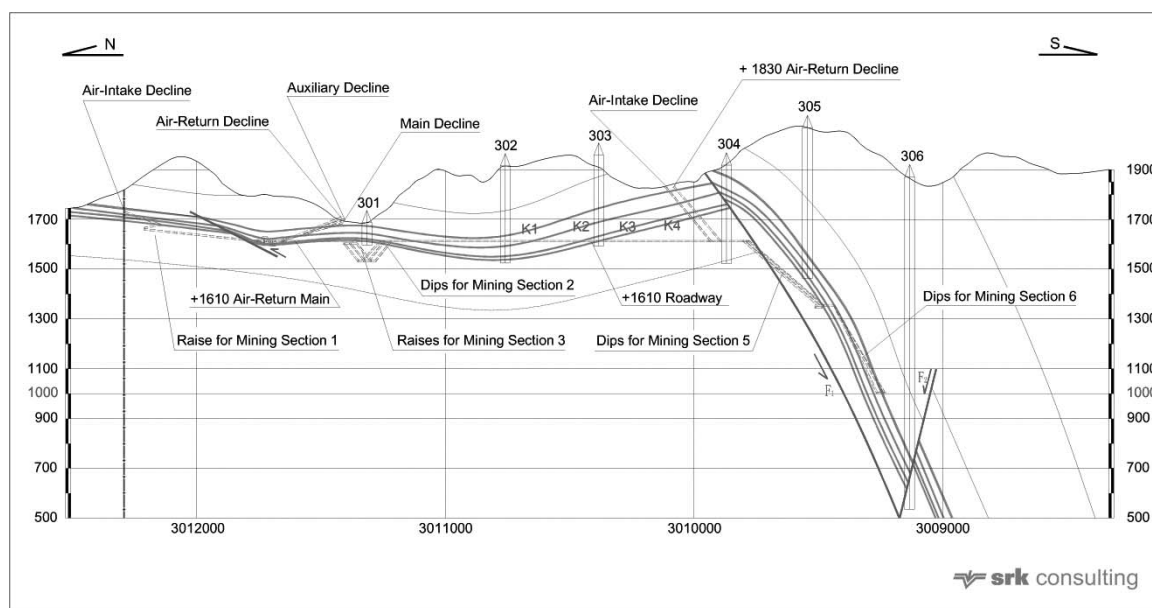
Typical North-South Cross Section through Lasu Mine
